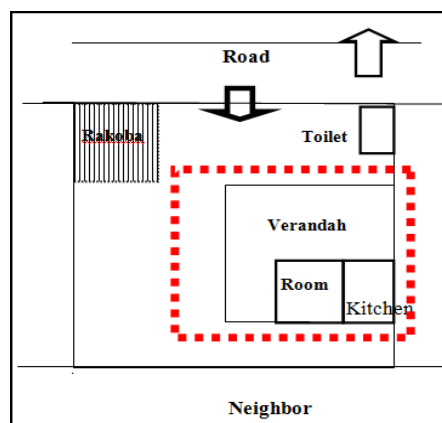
House Type A with partial adoption of the Ministry of Engineering Affairs' plan
